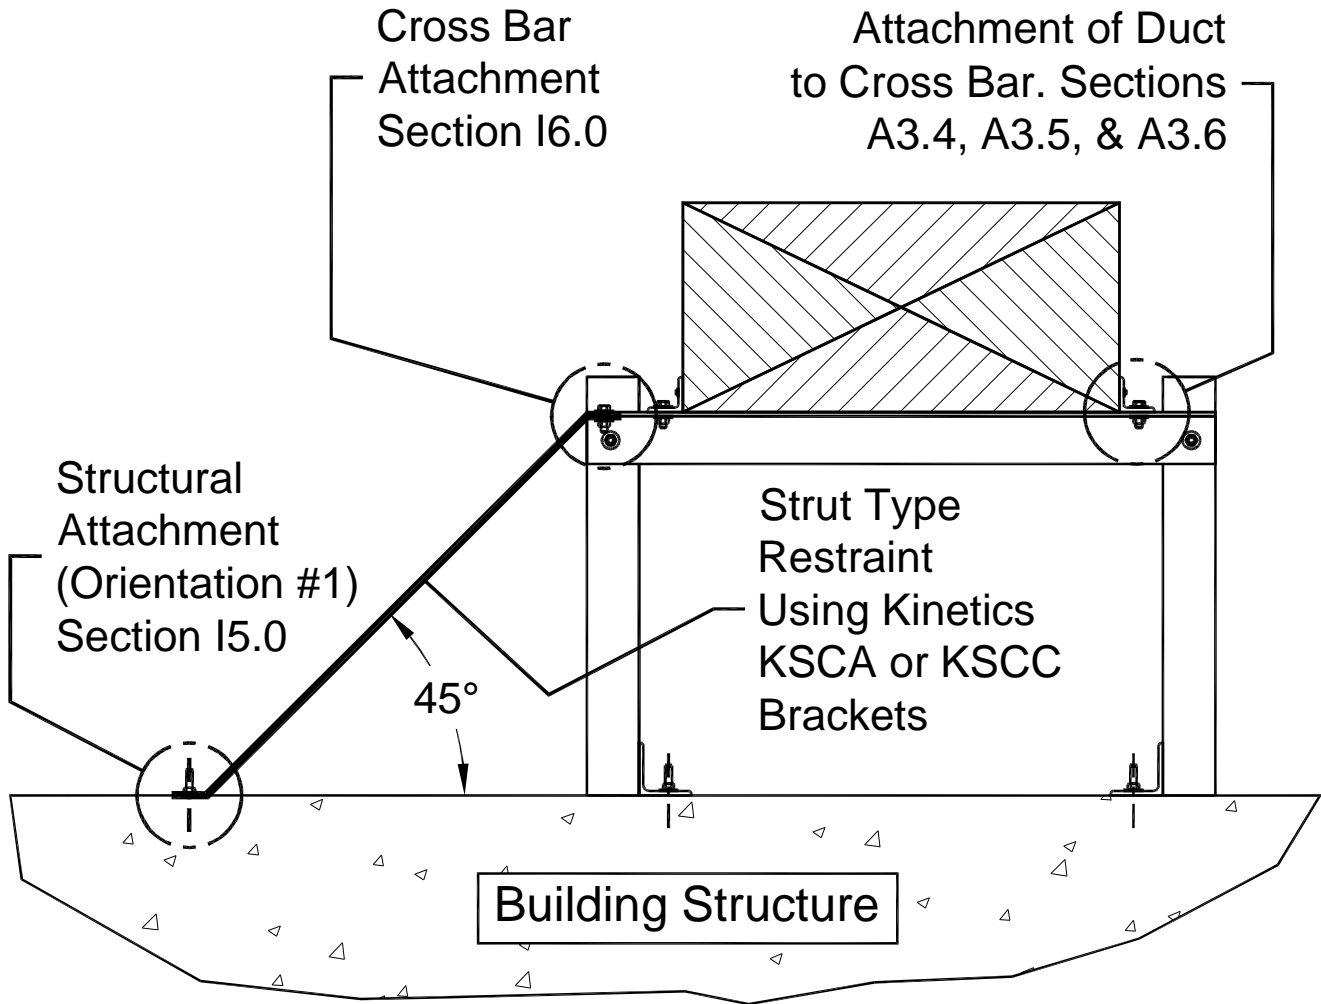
; Transverse (T) Strut Type Restraint Schematic for Floor/Roof Mounted Duct – Side Strut at a 45° Angle
